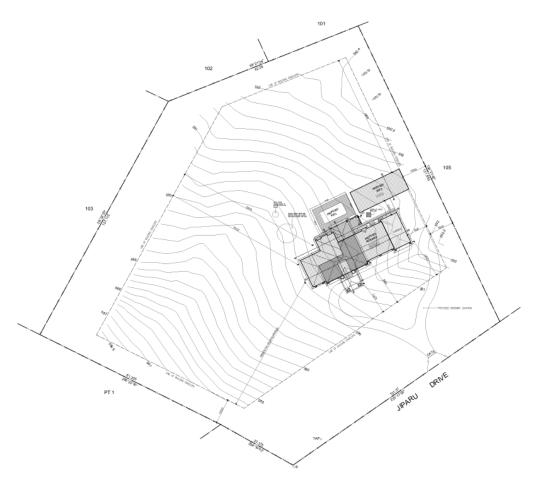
LAYOUT (R INVENTIVE BUILDING DESIGN)
